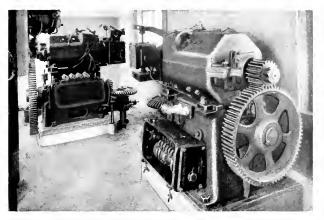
Typical Operator's Cabin, interior view, showing a valve motor, Locks 8 to 15 inclusive, Erie Canal
